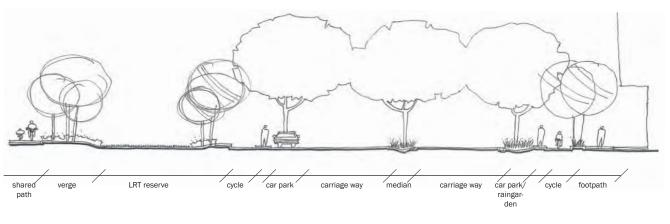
Indicative Plan and Section Low Volume Streets - Road 2
